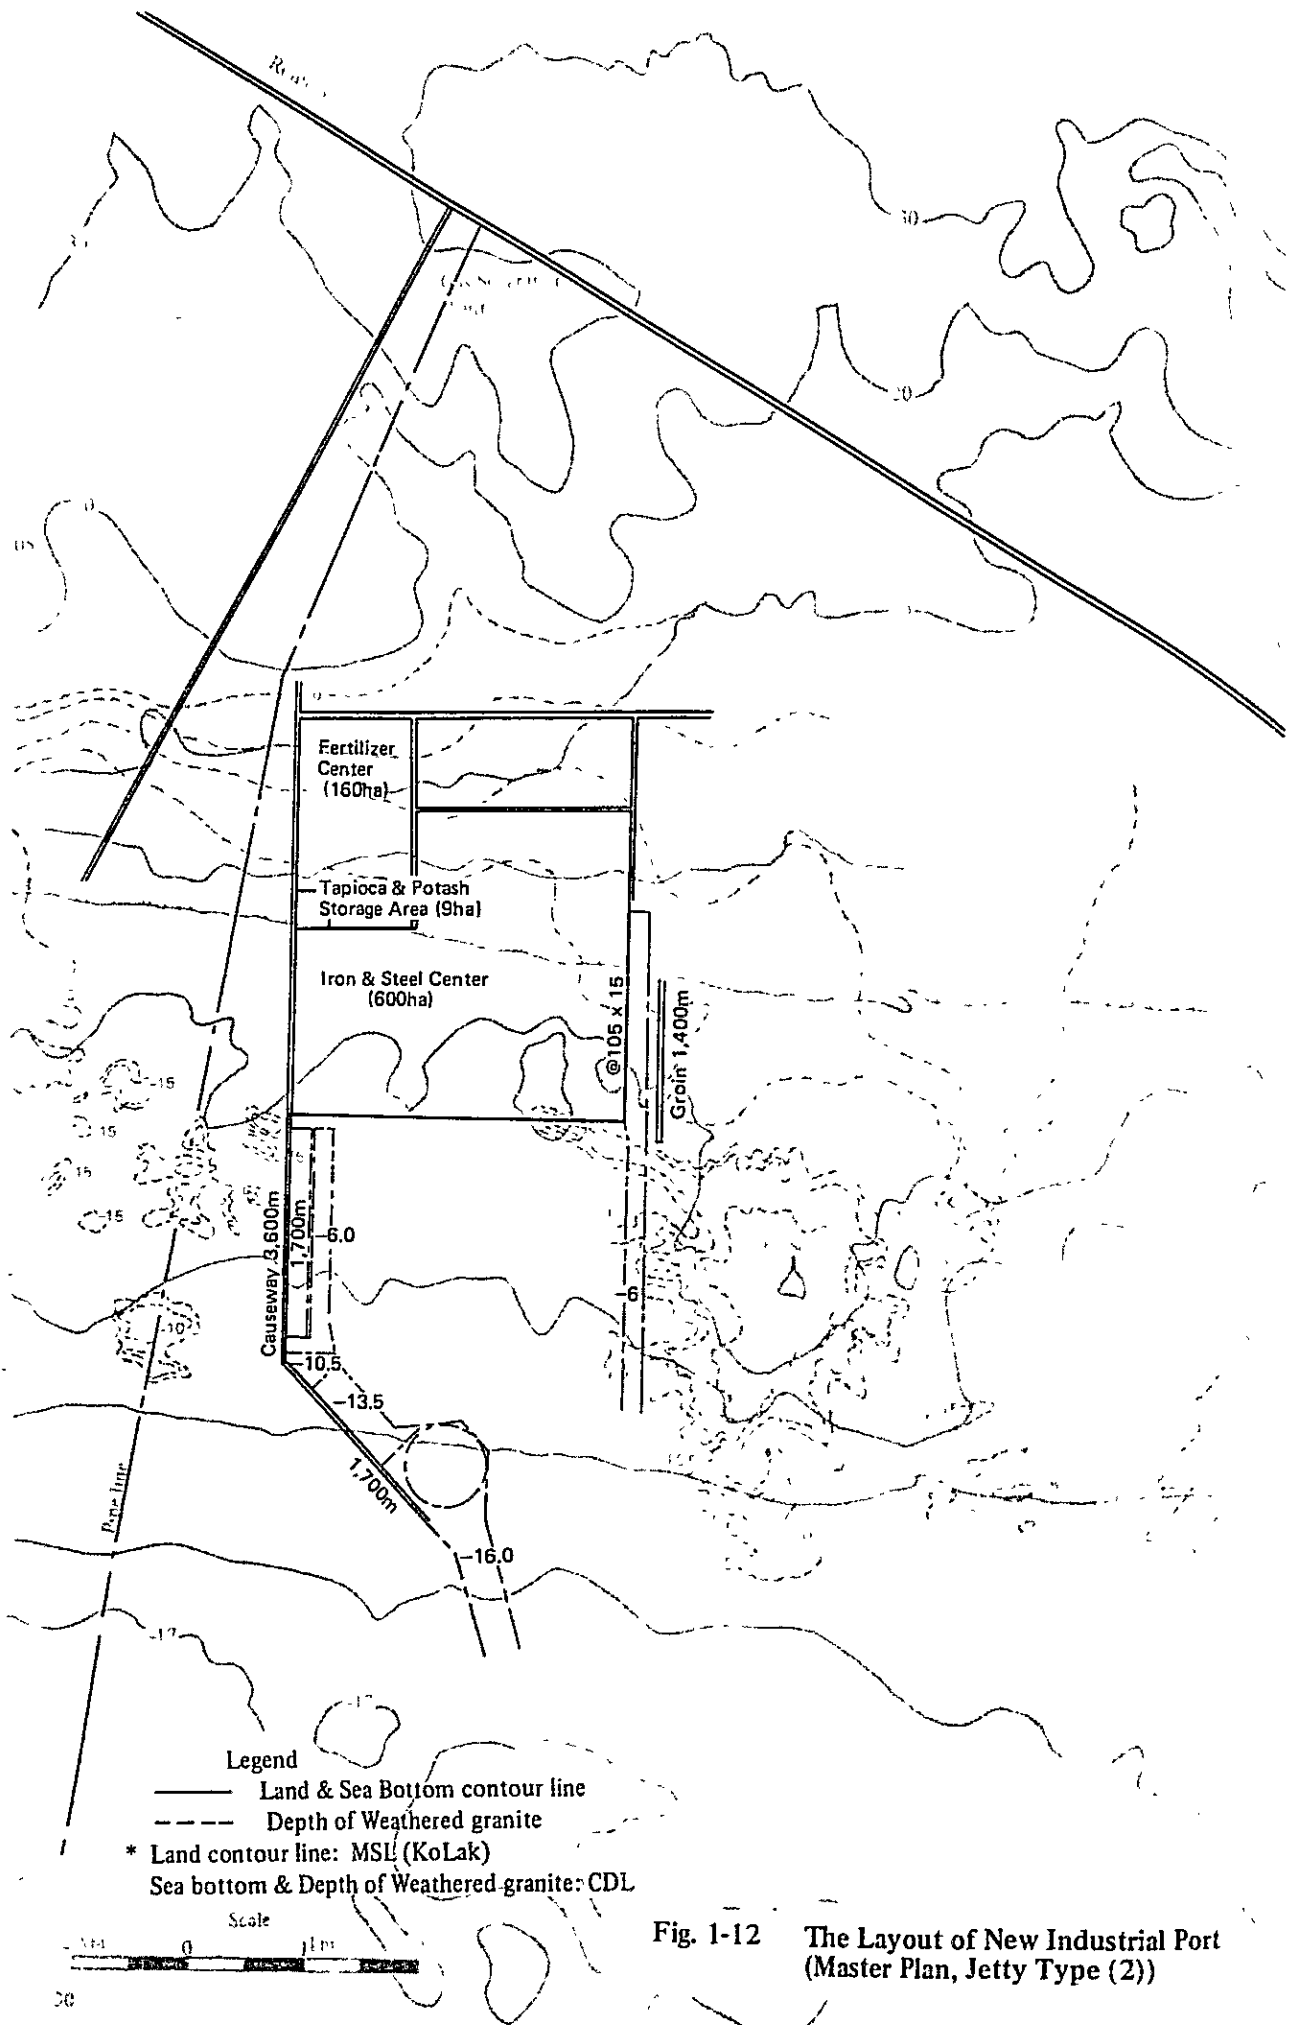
The Layout of New Industrial Port (Master Plan, Jetty Type (2))
